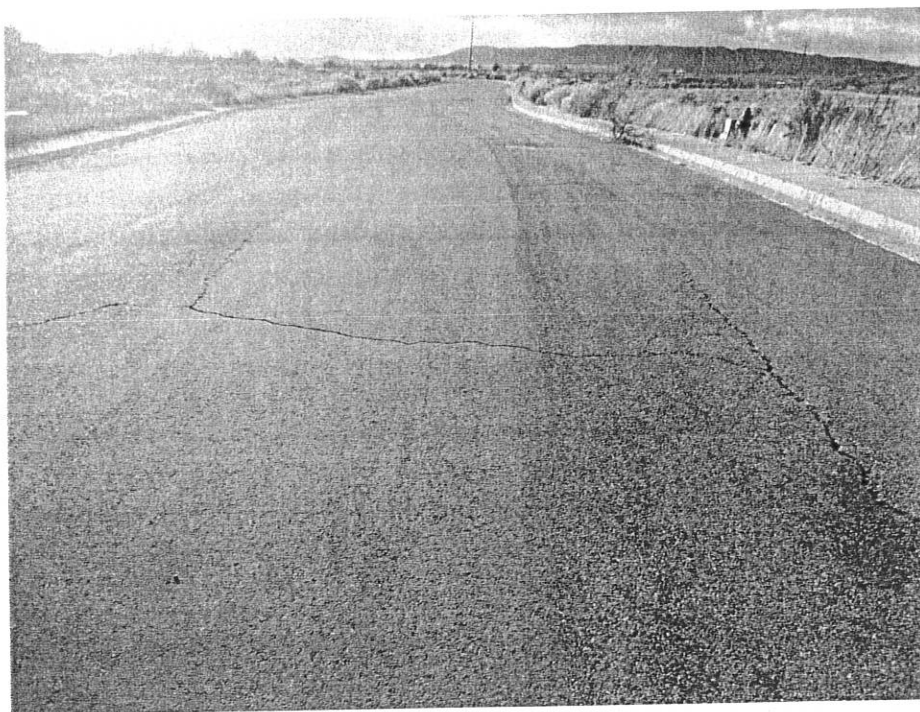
Good Surface Drainage – 560 West from 300 North to DEAD END
